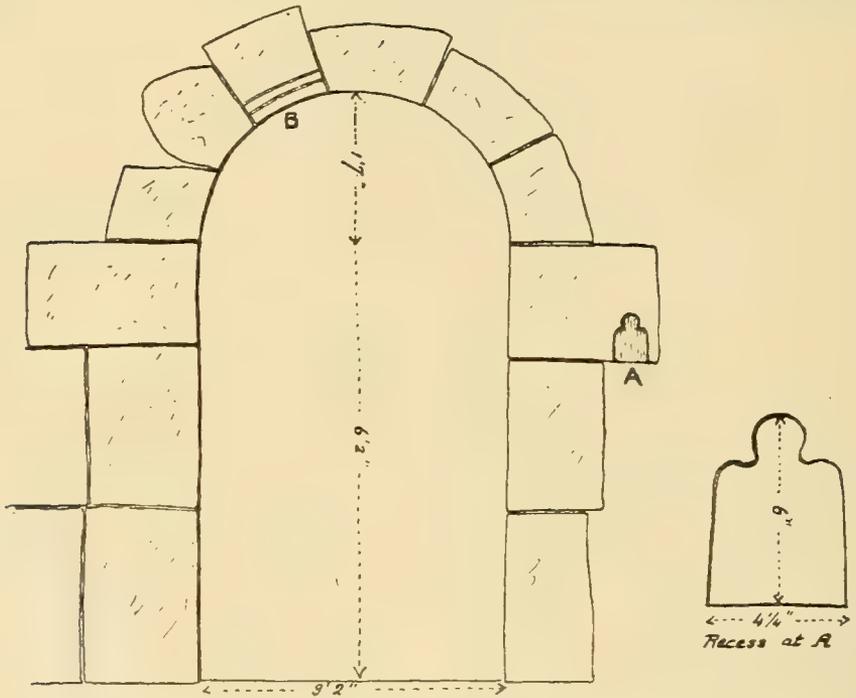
Elevation of Door of Saints' Graveyard. Western Face.
